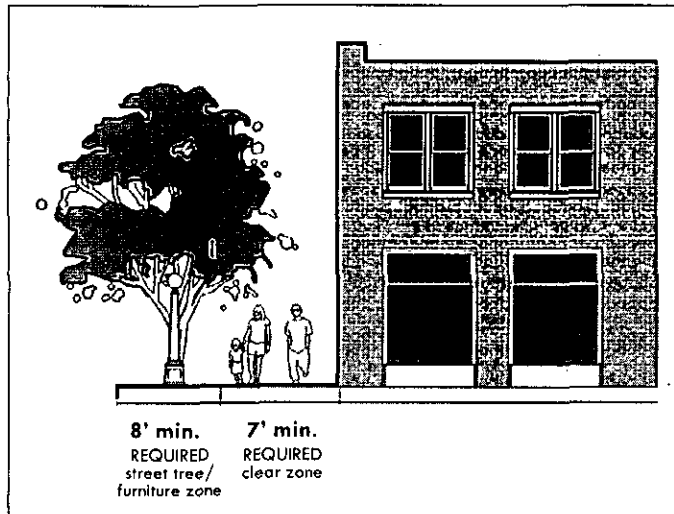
Core transit corridor sidewalk requirements. Street trees are required along core transit corridors with an average spacing not greater than 30 feet on center.
